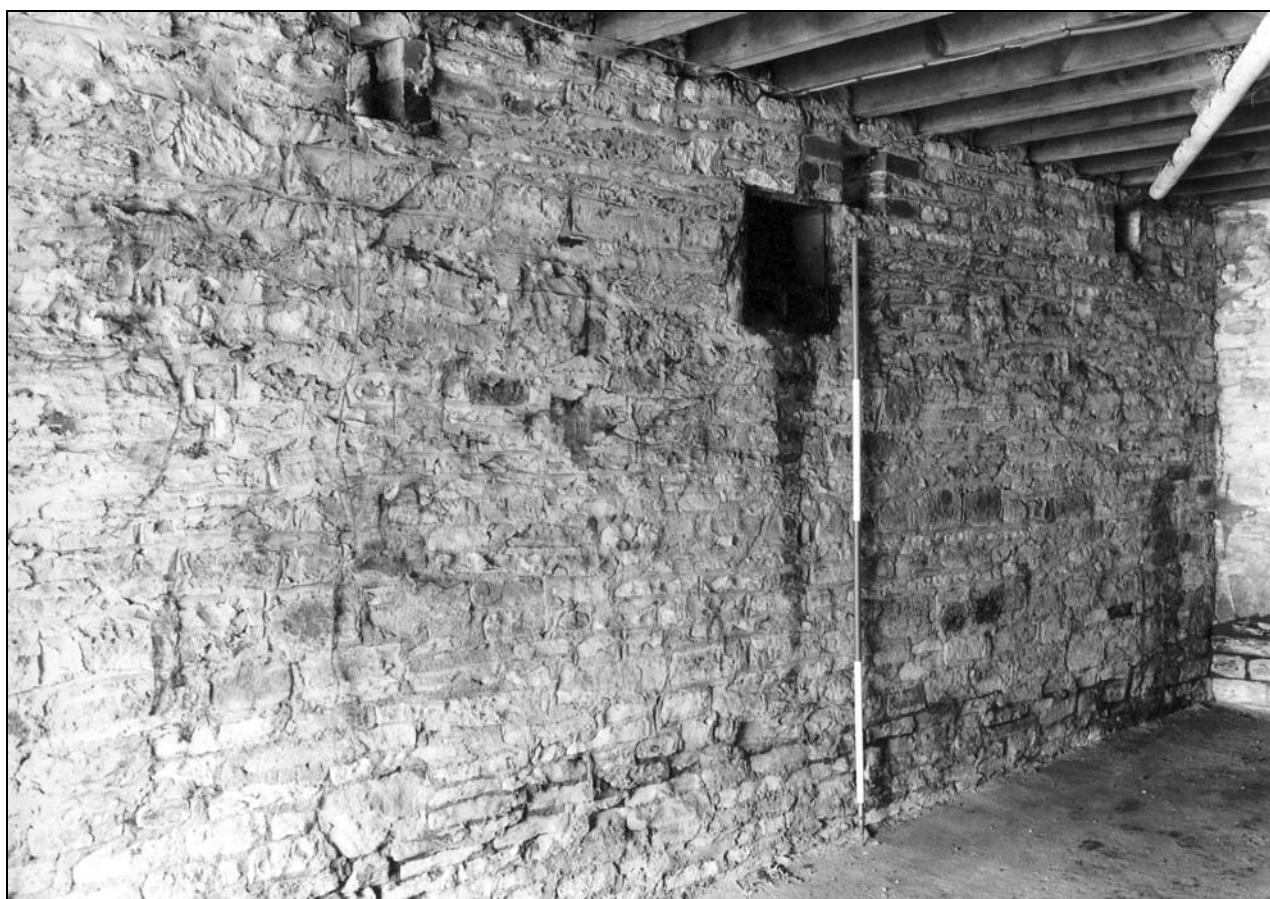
Building 1: east side of west ground floor room (film 2, frame 10)
